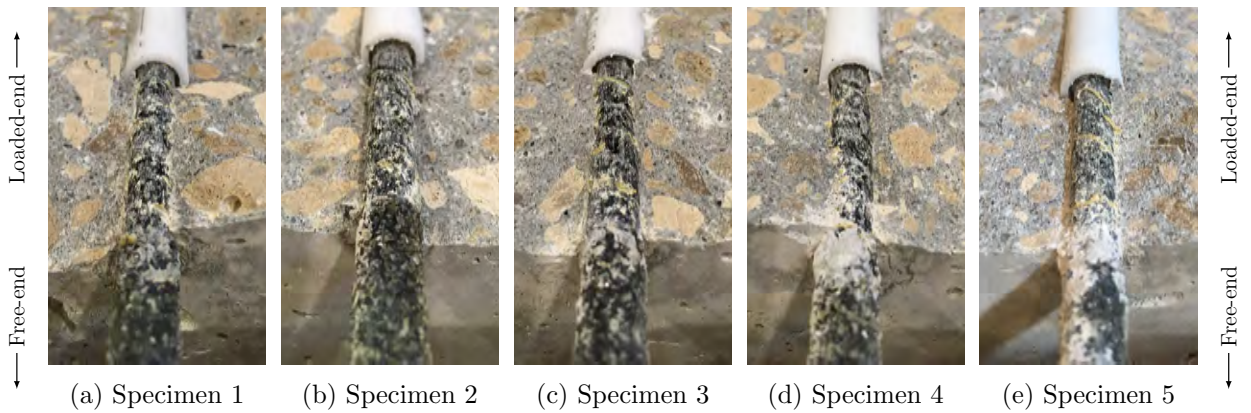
Overview rebar surface after bond strength test on type C Lot 1 rebar # 3
